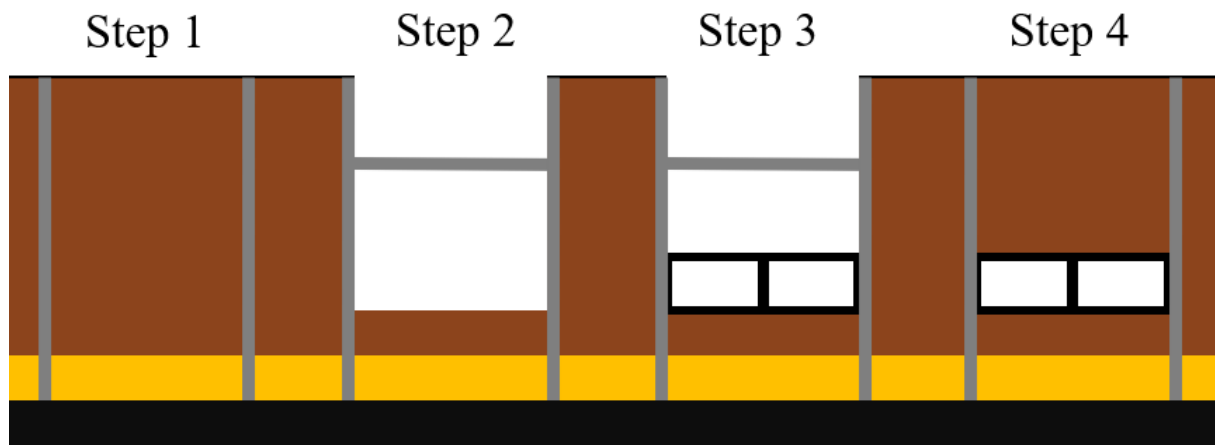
Construction steps of a deep excavation in clay, after Trafikverket (2020).
